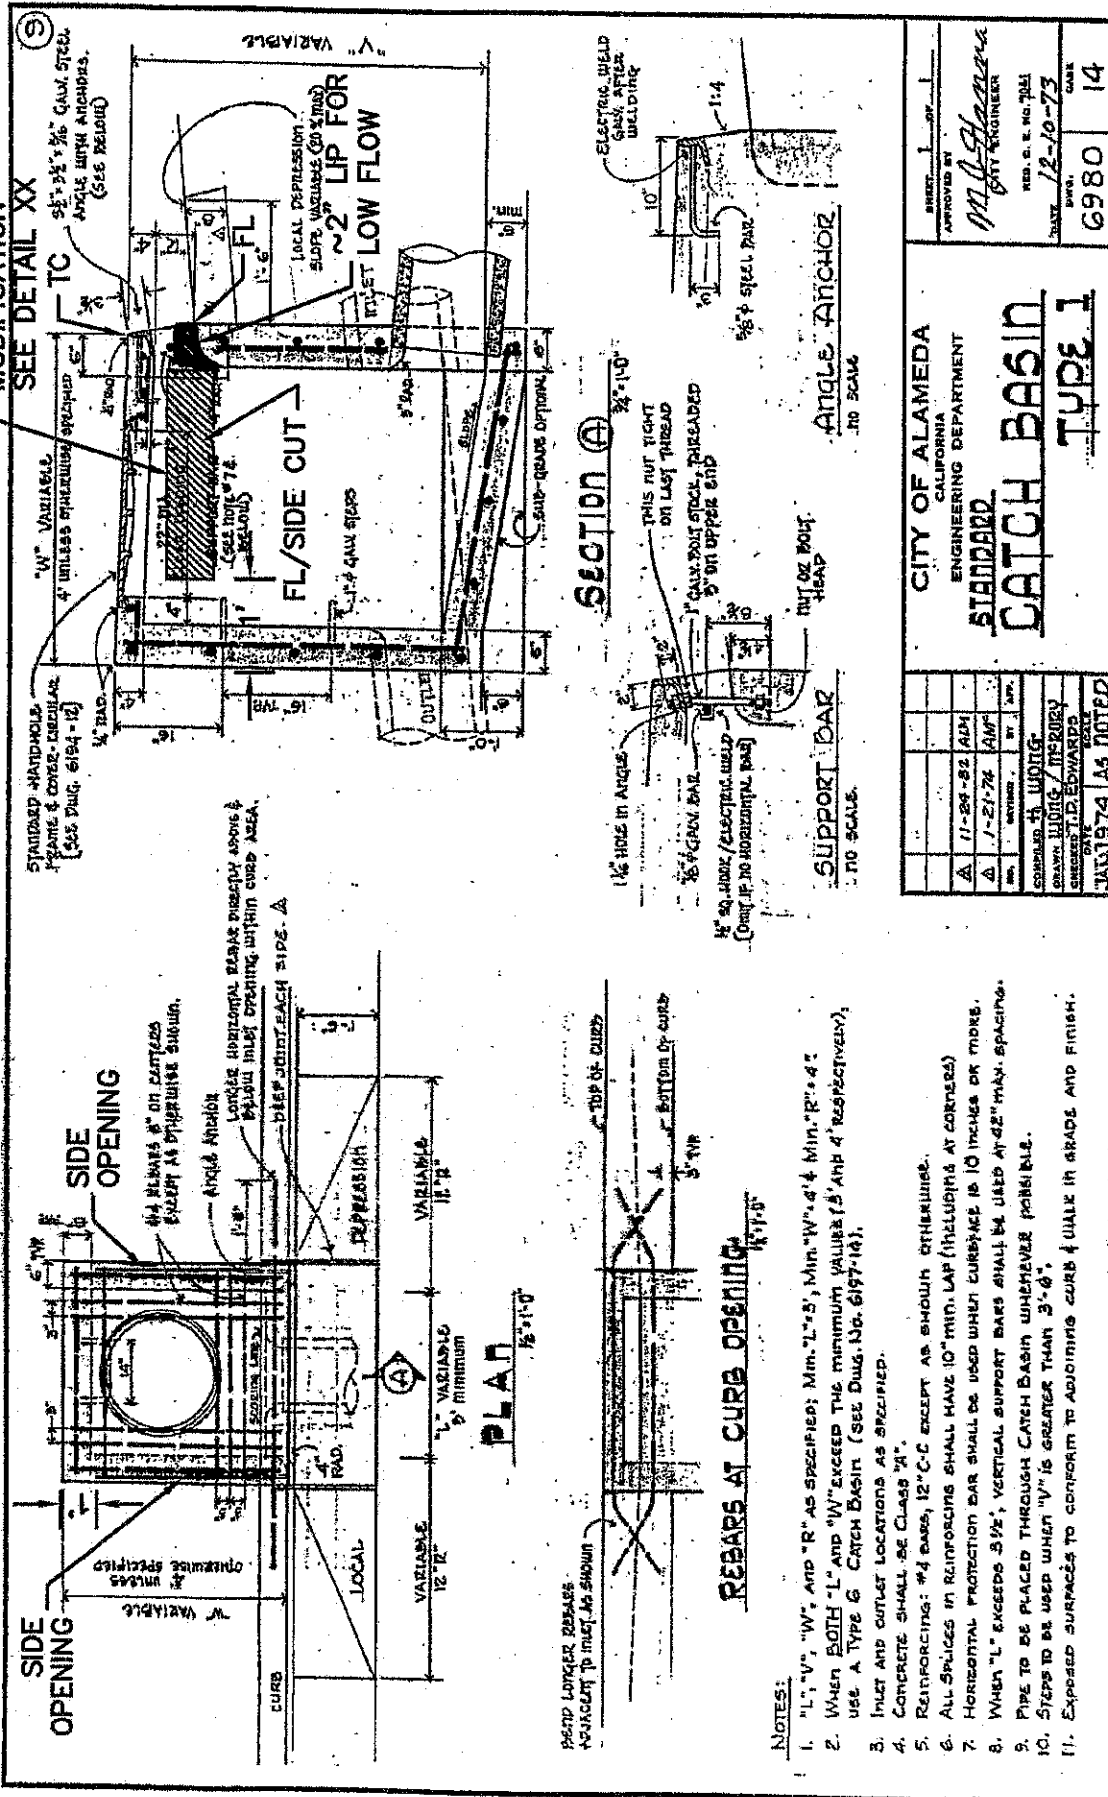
BIORETENTION STORM DRAIN CURB INLET
